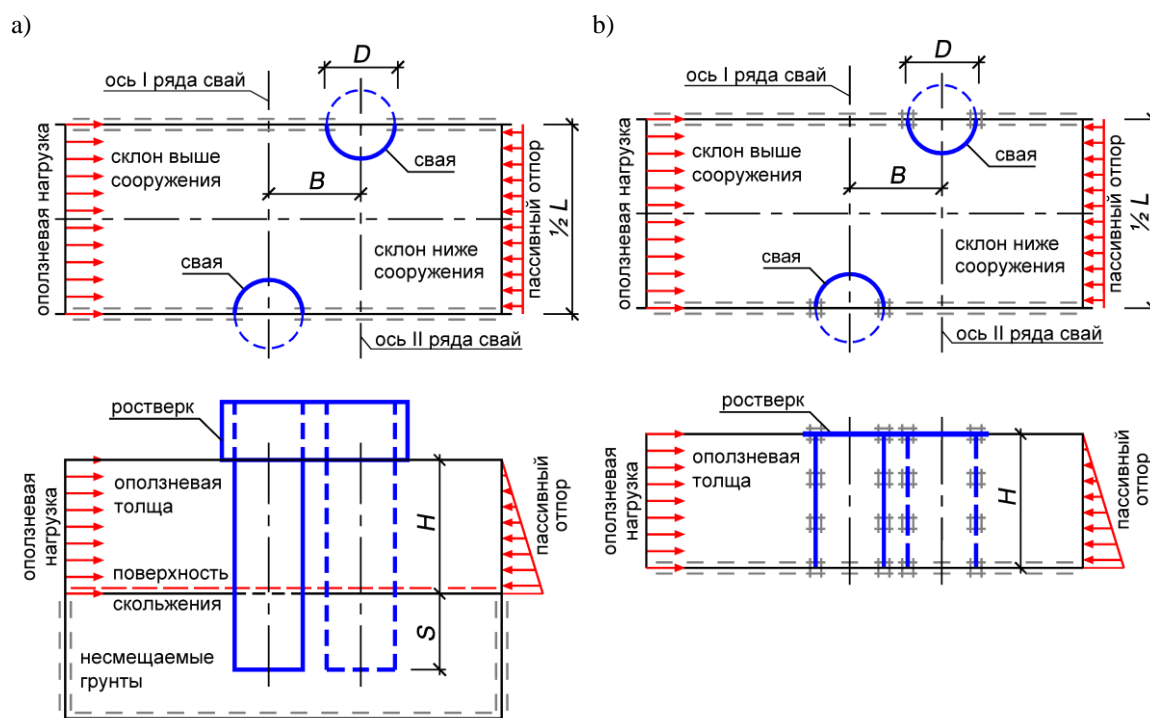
Design model of the spatial problem of the interaction of the soil with the piles of the two-row structure with (a) elastic embedding of the piles and (b) structure with rigid grouting of the piles (up view in plan, down view in section)
